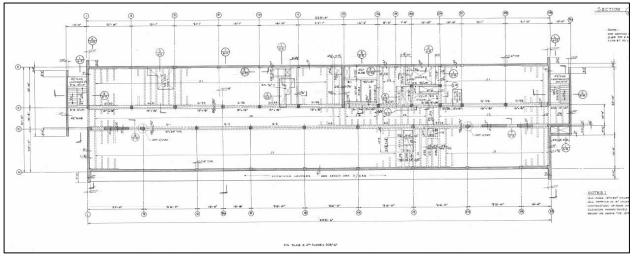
4<sup>th</sup> Floor Framing Plan (North Tower)
